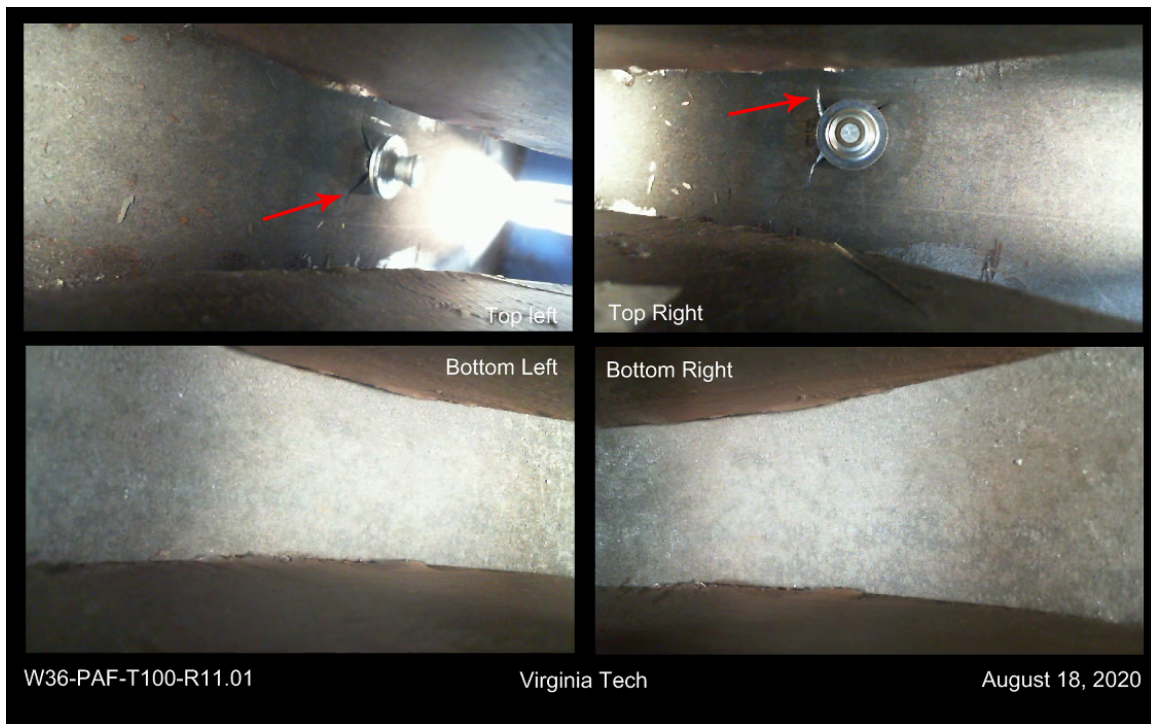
Fracture initiation of W36-0.75PnAF-T100-R11.02.
